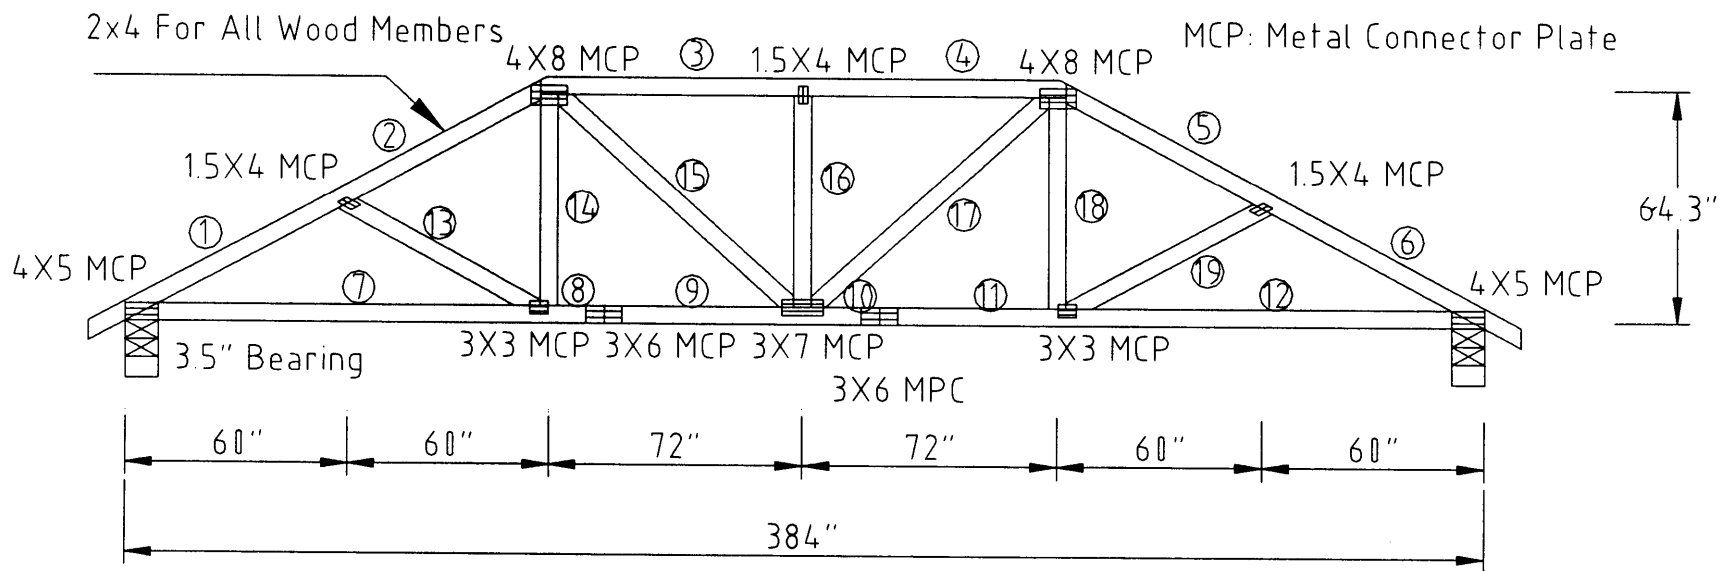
MPC Truss Type AS3 from a Truss Plate Manufacturer
